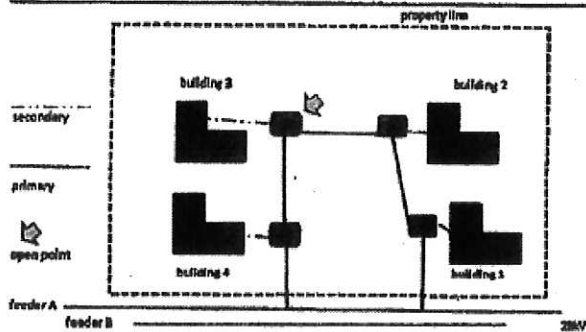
MULTI BUILDING CONNECTION greater than 1,000kVA
